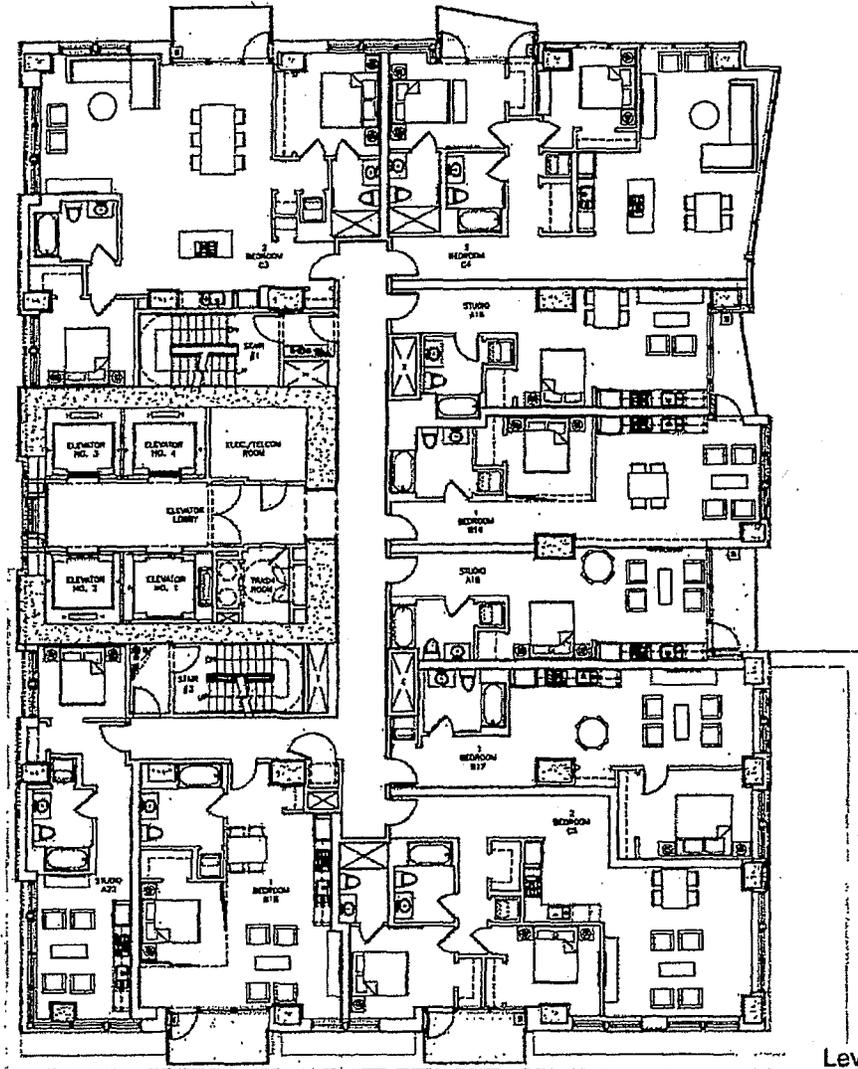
through 7 depict several floor plans and all four elevations of the modified project.
